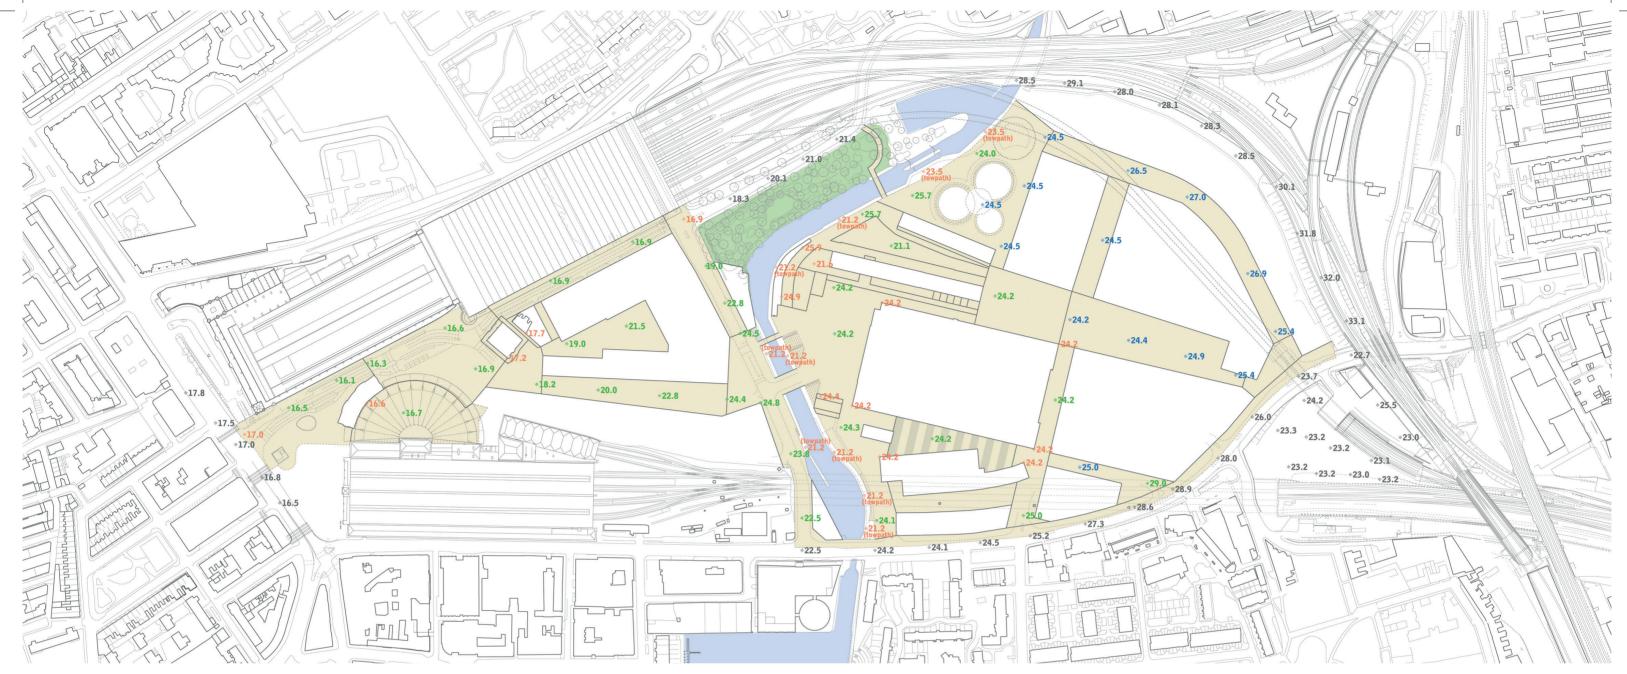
Extract from Parameter Plan KXC012 showing proposed finished site levels
